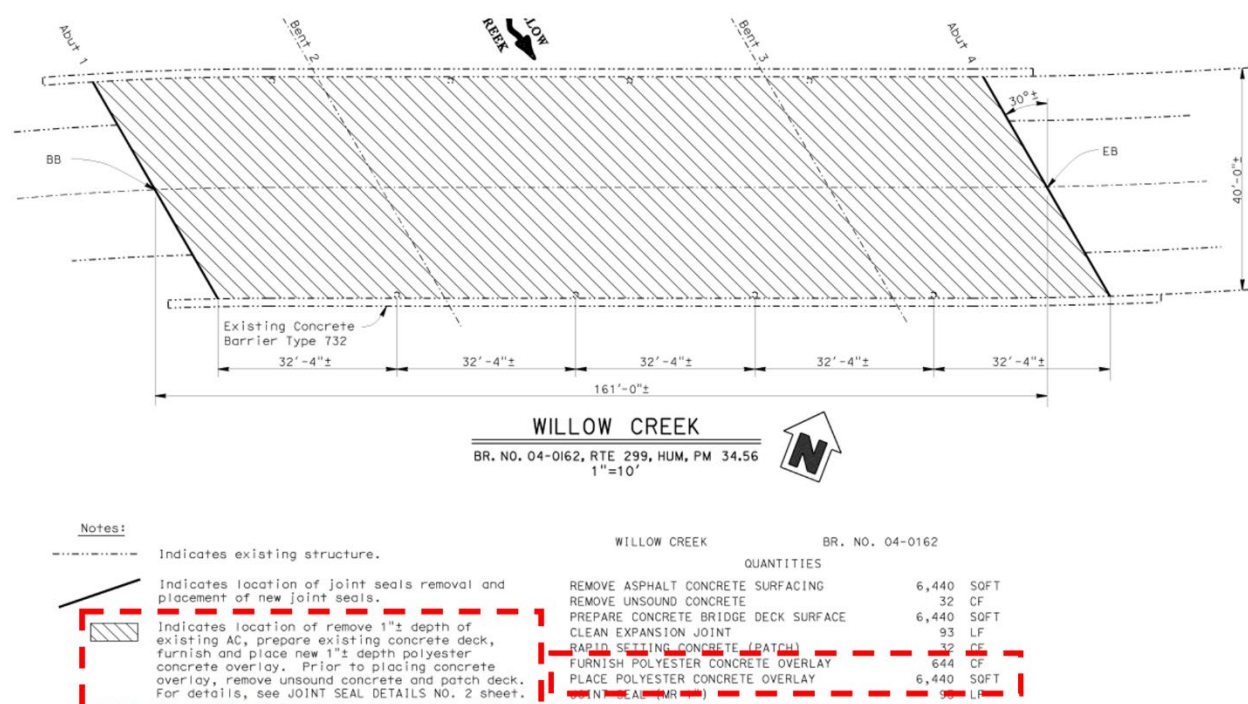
Bridge Plan Sheet with Polyester Overlay across Entire Deck
